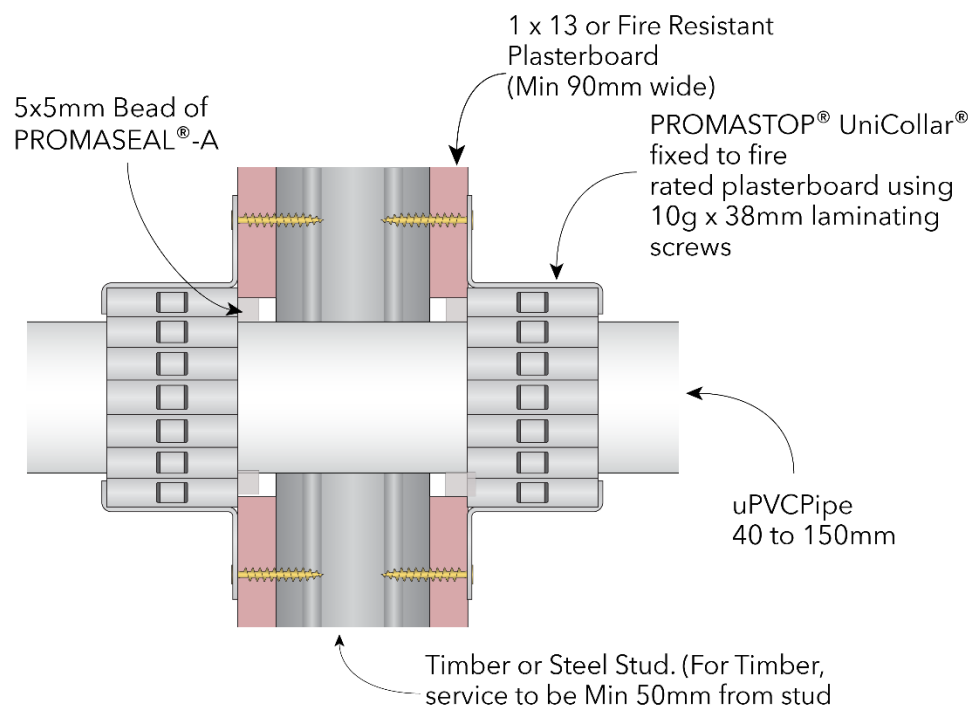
Cross sectional view of uPVC pipe penetrating 1hr plasterboard wall protected by PROMASTOP® UniCollar® on either side of the wall
